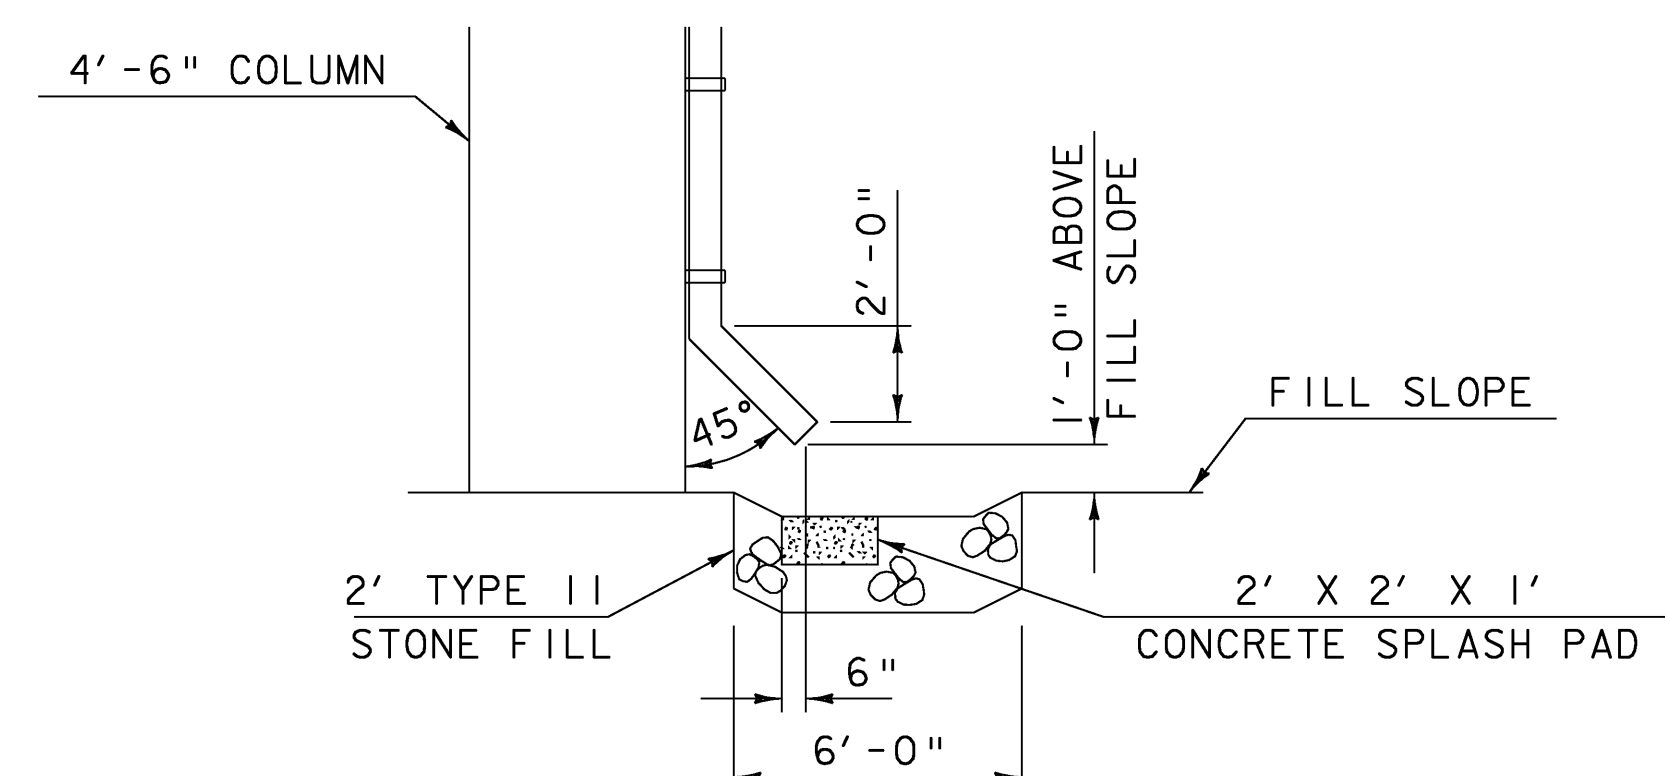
DETAILS FOR ATTACHING DOWNSPOUT TO PIER
